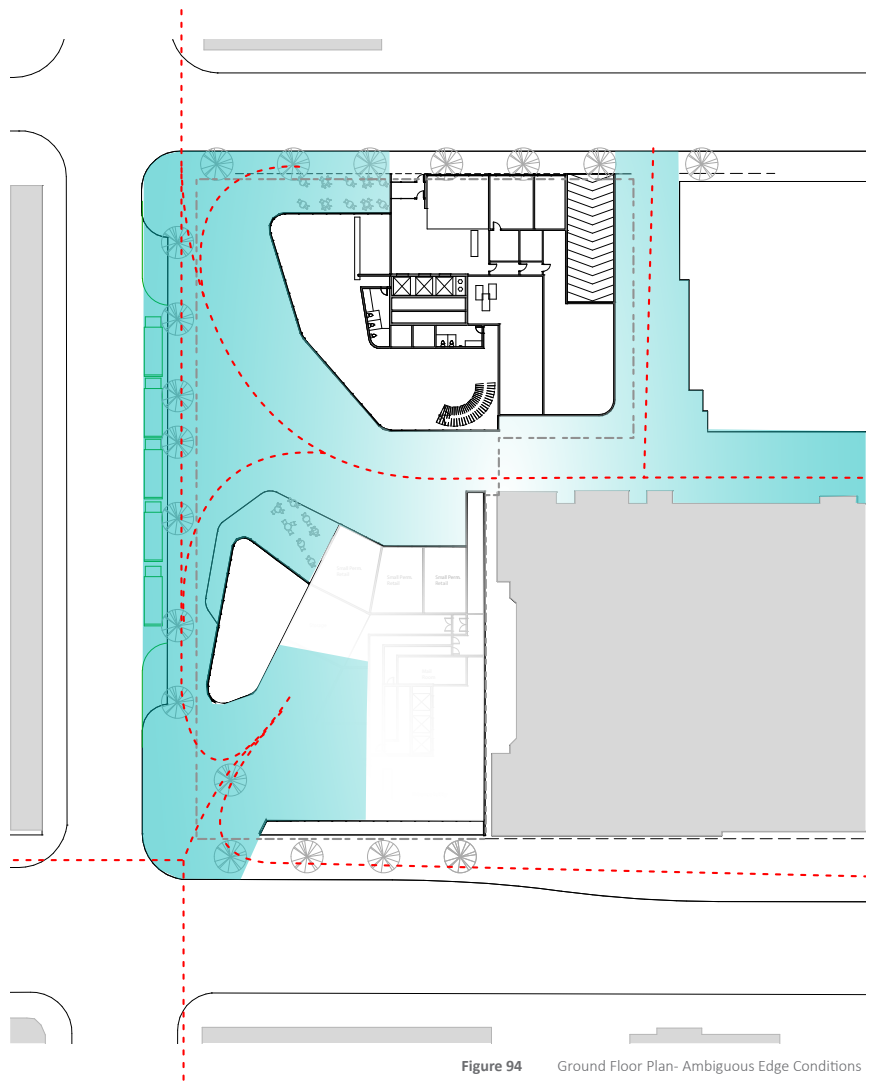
Ground Floor Plan- Ambiguous Edge Conditions
